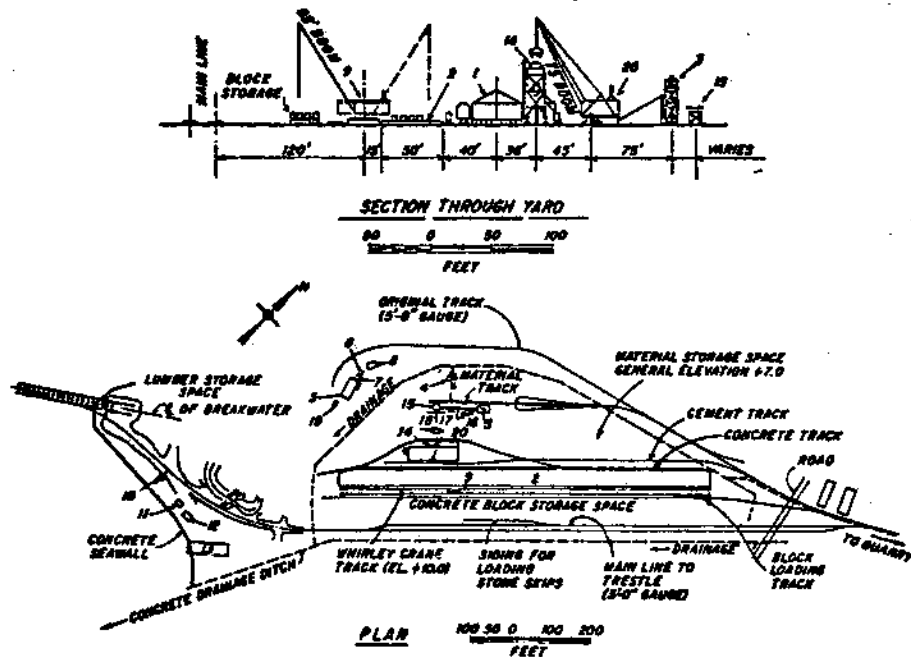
Casting Yard for Coco Solo Breakwater Concrete Armor Units. 1) Cement storage shed, 2) Block casting platform, 3) Aggregate hopper, 4) Settling tank, 5) Storehouse, 6) Saw shed, 7) Carpentry shed, 8) Concrete building, 9) Whirley crane, 10) Water tank, 11) Oil storage, 12) Concrete building, 13) Office and quarters, 14) Concrete plant, 15) Screening plant, 16) Aggregate conveyor, 17) Sand stock pile, 18) Gravel stock pile, 19) Shed, 20) Whirley crane (Quinn, 1972, p. 207)
